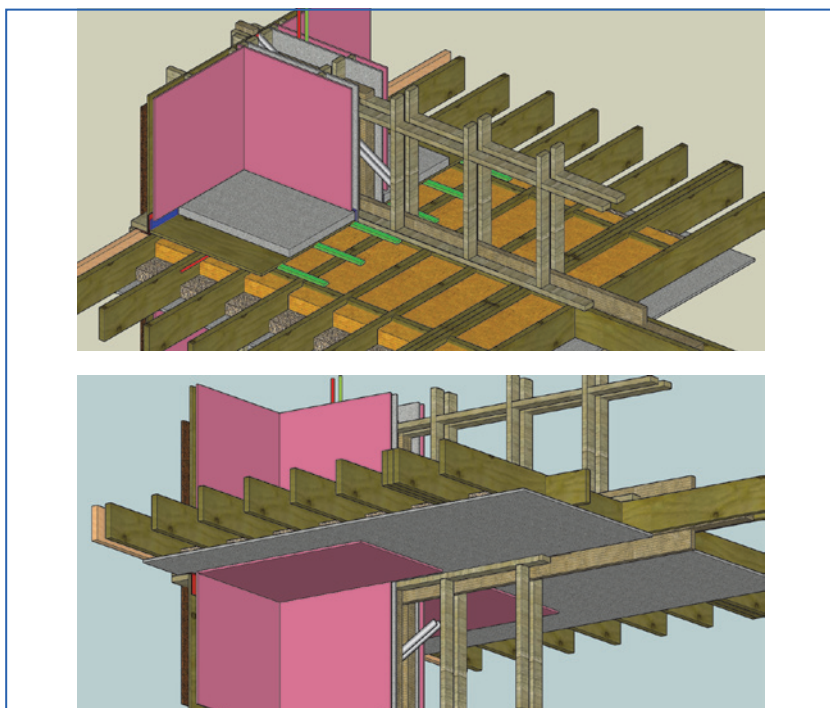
More views of the total concept of the LWTF construction principle for the construction of low rise apartment buildings (max 4 floors).
